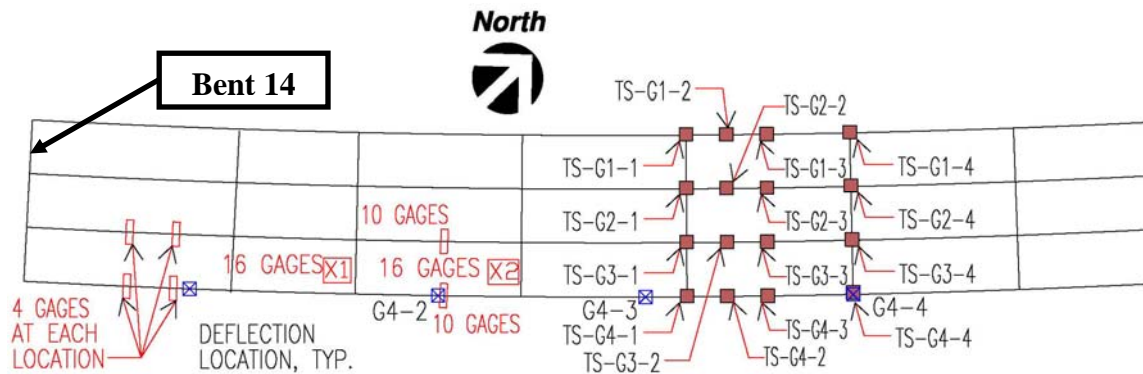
Instrumentation Plan for SH 71-SH 130 (Span 14)
